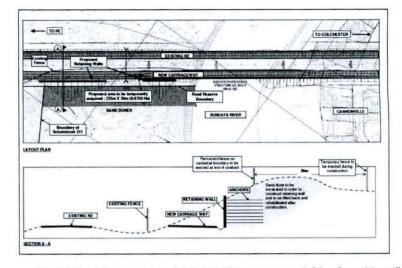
Figure illustrating proposed road route and temporary removal of dune for retaining wall construction.
